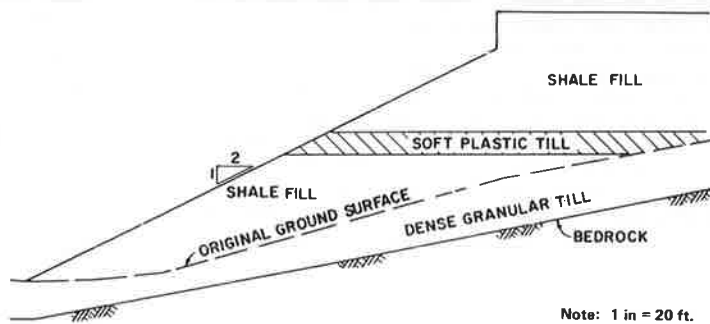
Section at bridge end slope of Suits Ravine, I-88.
